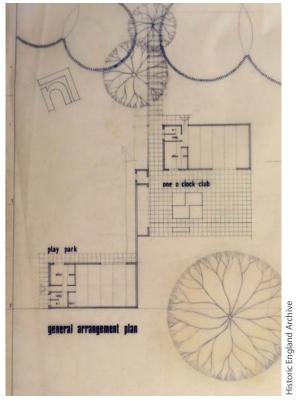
GLC plan for the building of the One O' Clock Club, 1972-3
